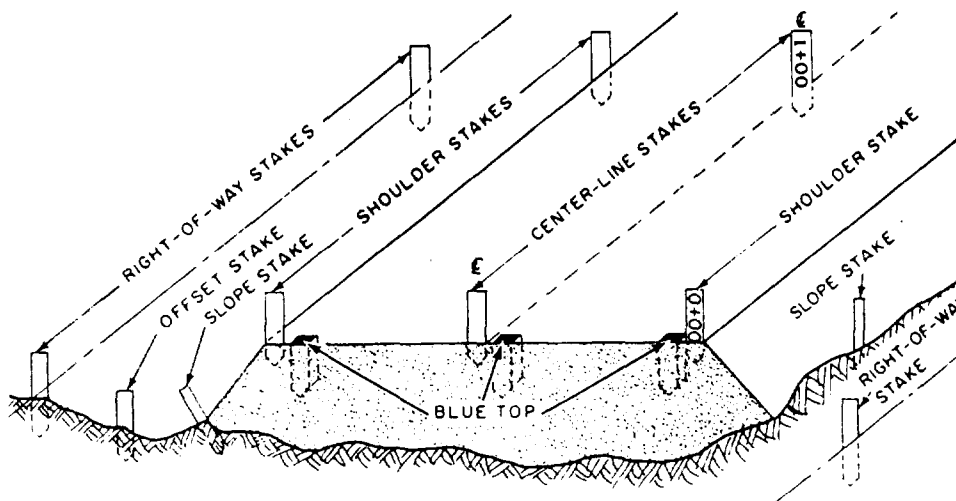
Typical arrangement of various hubs and stakes on a road section (final grading).
